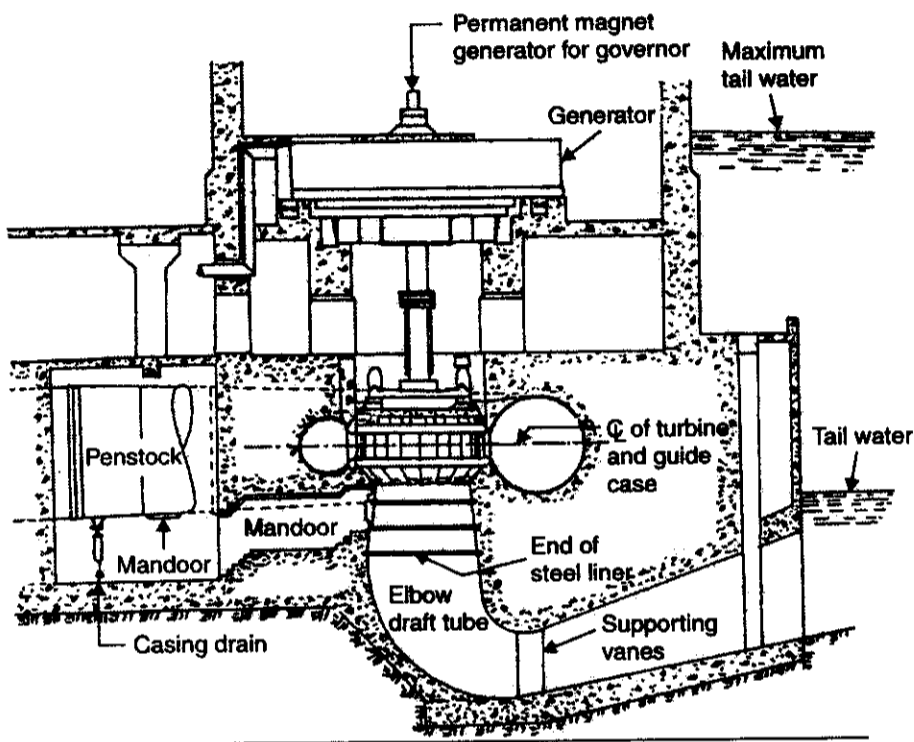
Plate-steel spiral-case setting of vertical Francis turbine, welded casing.
